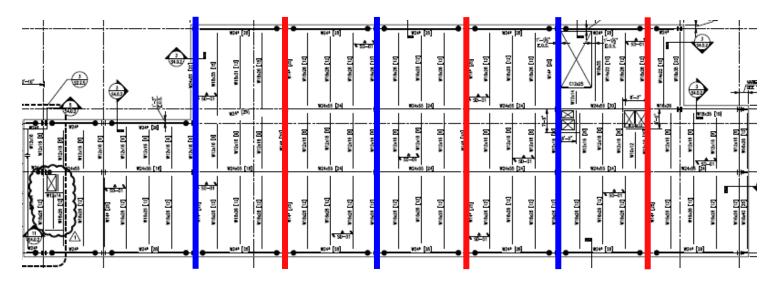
Typical Truss Layout Drawing Courtesy of JCJ Architecture
